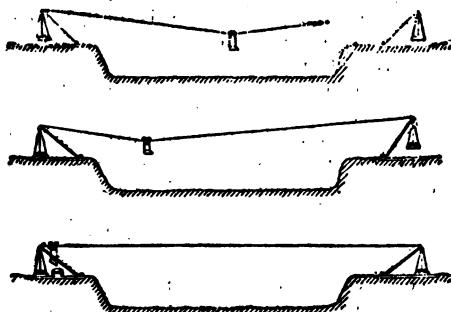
Balanced Cable Crane Horizontal Cableway.
